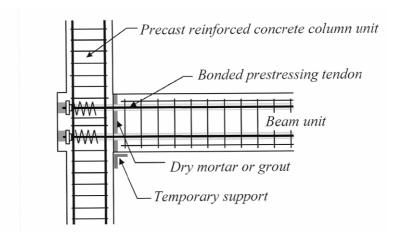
General reinforcing details of equivalent monolithic post-tensioned system 1
